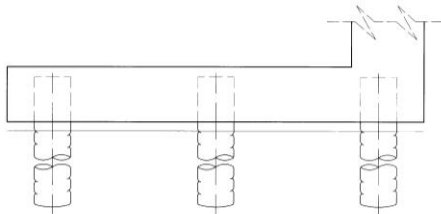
Screw piles with high and partial soil displacement used as ground improvement
